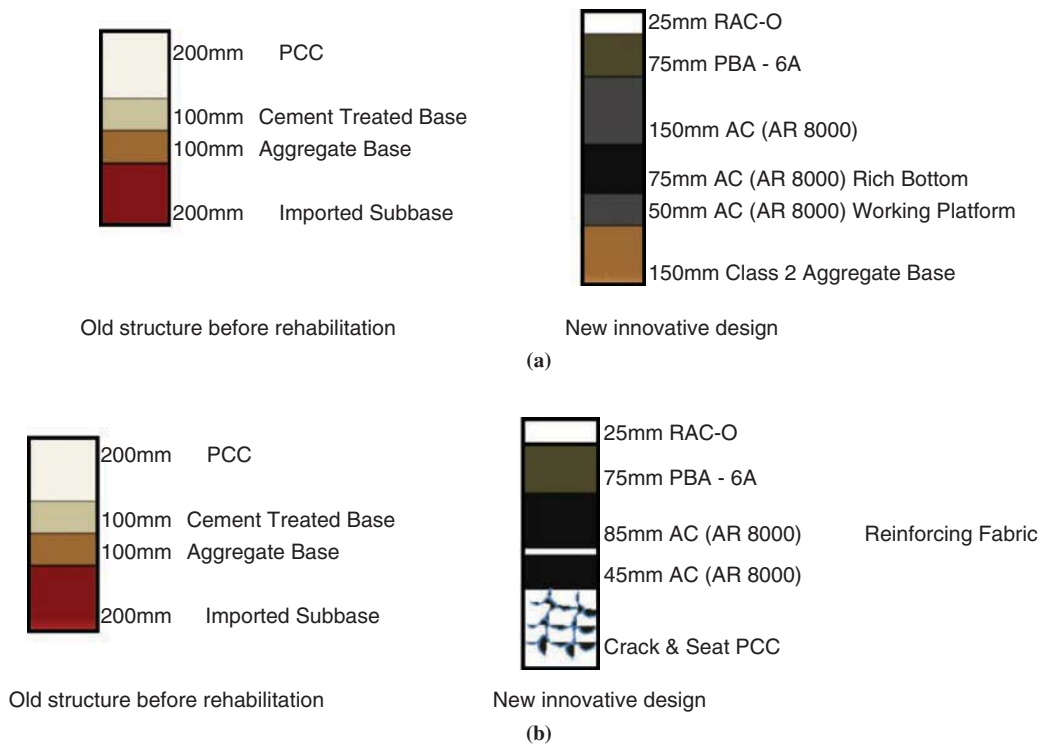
Existing structure and innovative designs: (a) full-depth asphalt concrete (AC) sections and (b) crack and seat sections (RAC-O = recycled asphalt concrete, open-graded mix).
